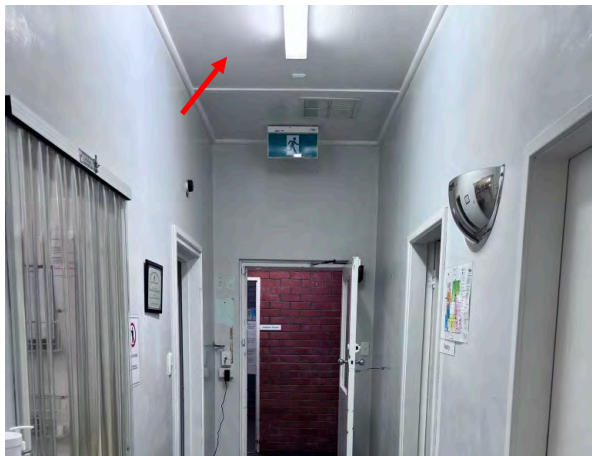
Wentworth Hospital Services - Internal Hotel Services hallway – asbestos ceiling lining
